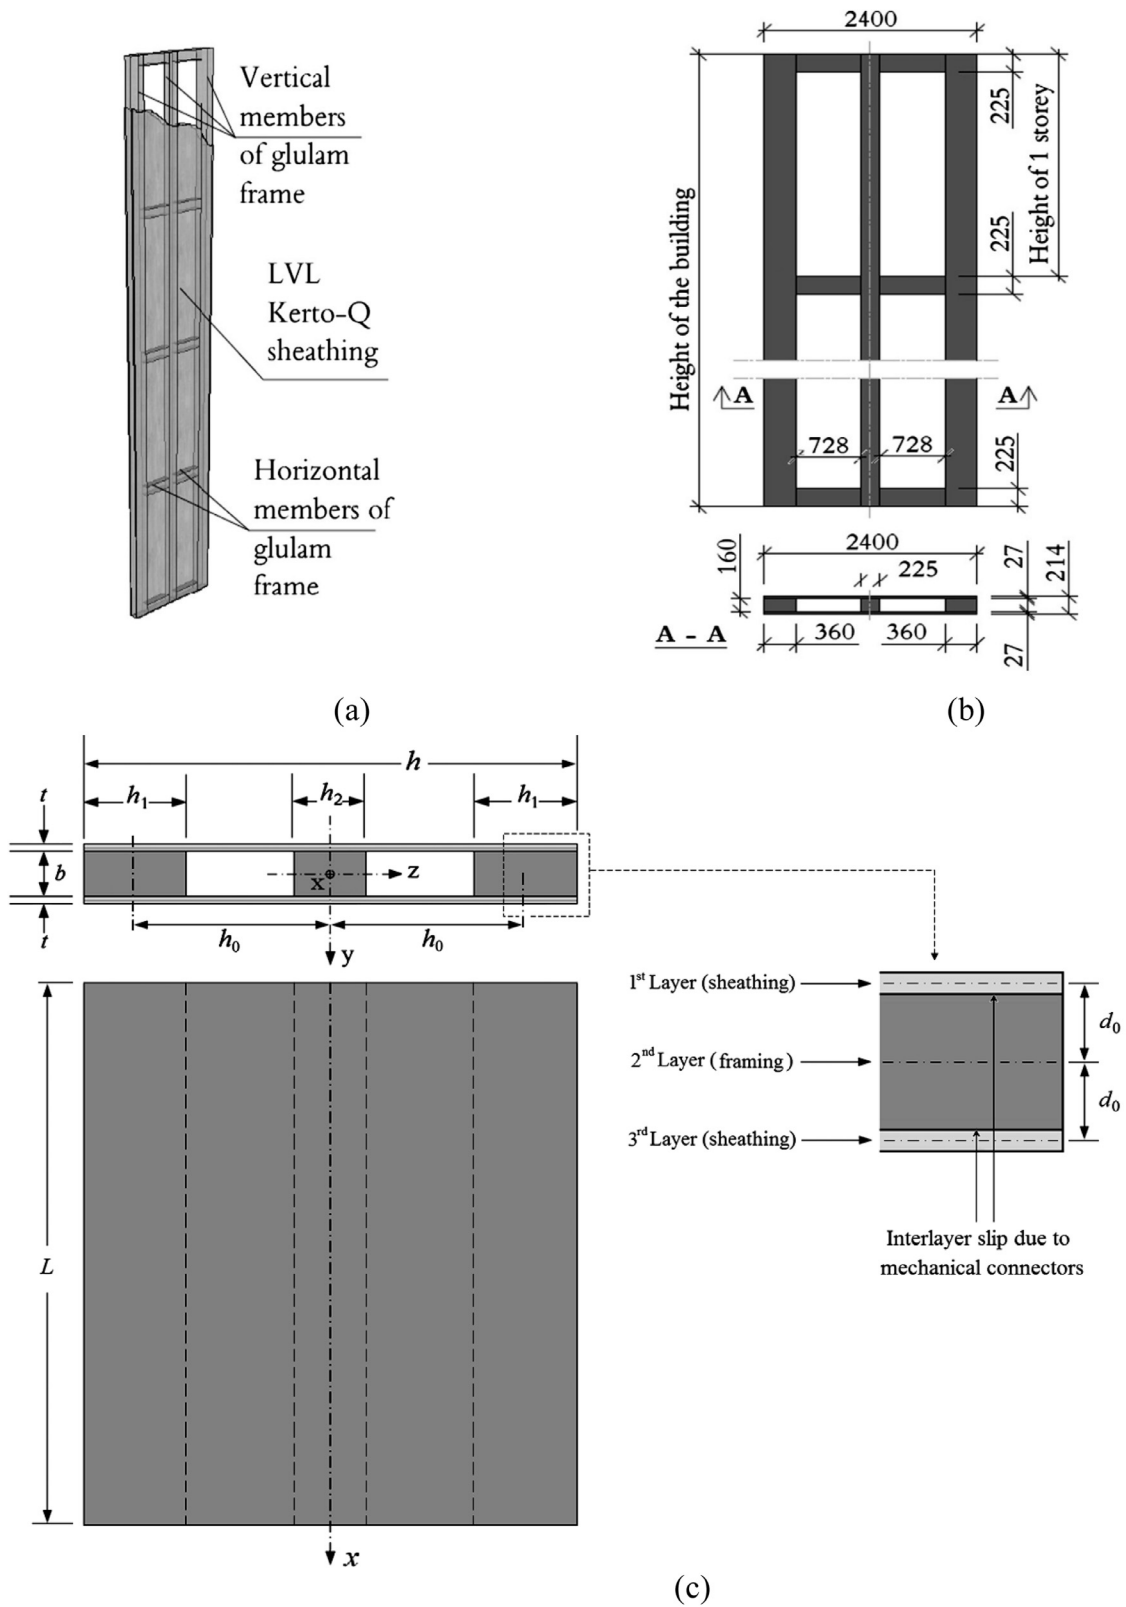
Geometrical configuration and cross-section of the Trä8 symmetrical composite stabilising wall element: (a) basic element in a multi-storey building (here shown as a four-storey building); (b) dimensions of the stabilising element; and (c) partial composite action model in the weak direction with possible slip due to mechanical connectors and notations for the cross-section.
